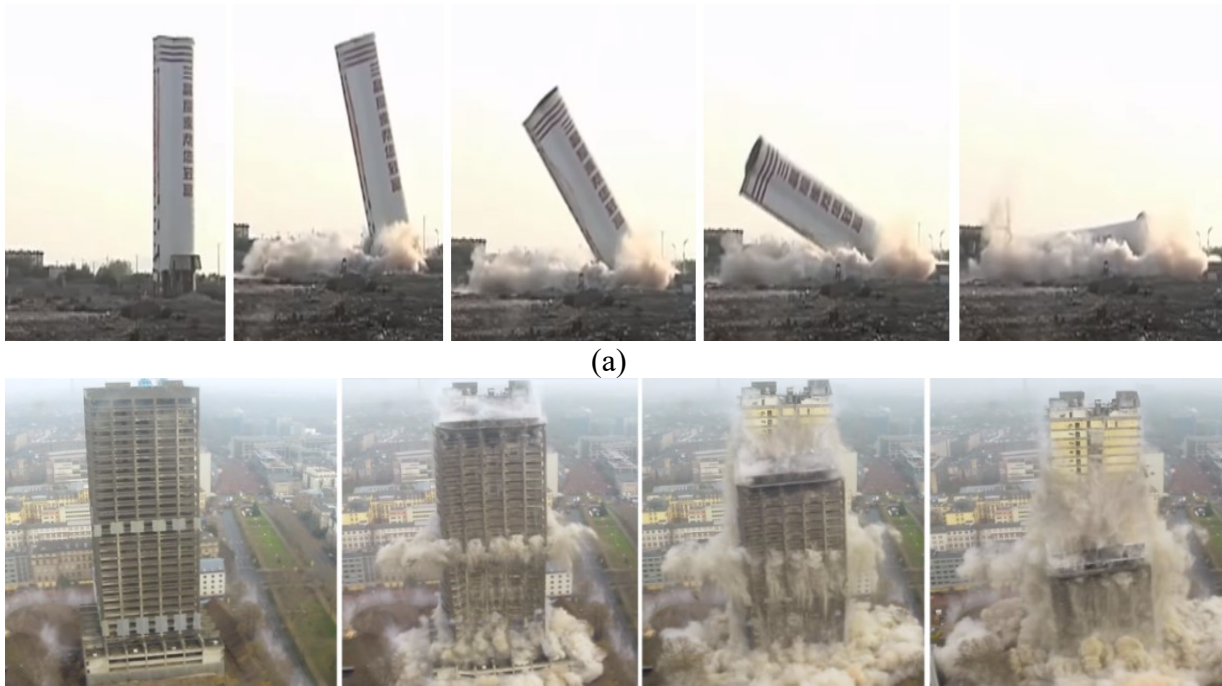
(a) Toppling of the structure and (b) Collapse of the structure within its boundaries
